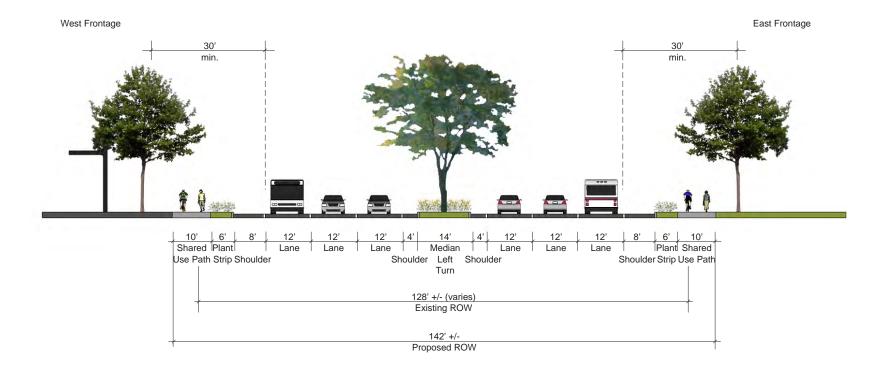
Existing and Proposed Conditions - Segment 4 Rural Highway Concept (South Kelly Road to Jameson Canyon Road)
